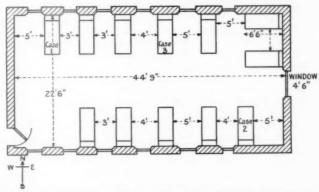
Plan of dormitory in which the three cases of "follicular tonsillitis" occurred. Elevation 12 ft. 3 in. Windows on north and south walls 2ft. 3 in. broad, 6 ft. 3 in. high. Scale 8 ft. = 1 in.
